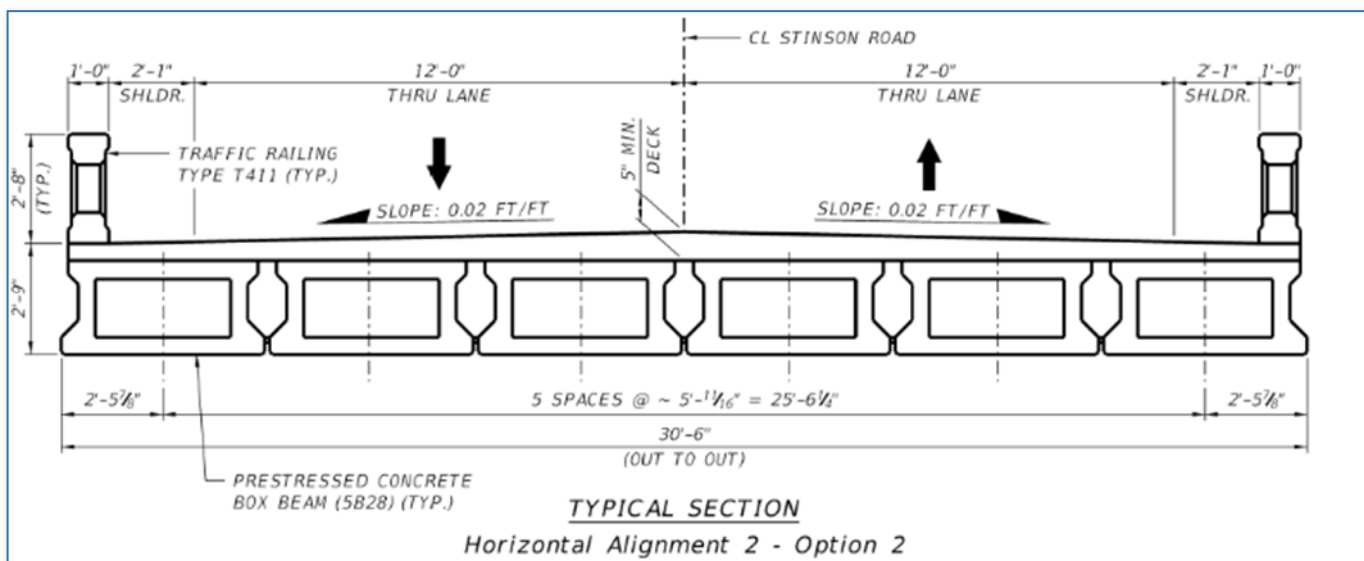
TxDOT Prestressed Concrete Box Beams (5B28) Typical Section
